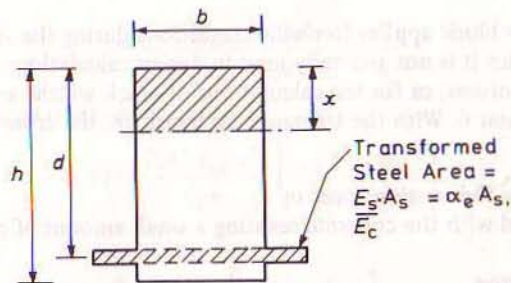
Equivalent transformed section with the concrete cracked
